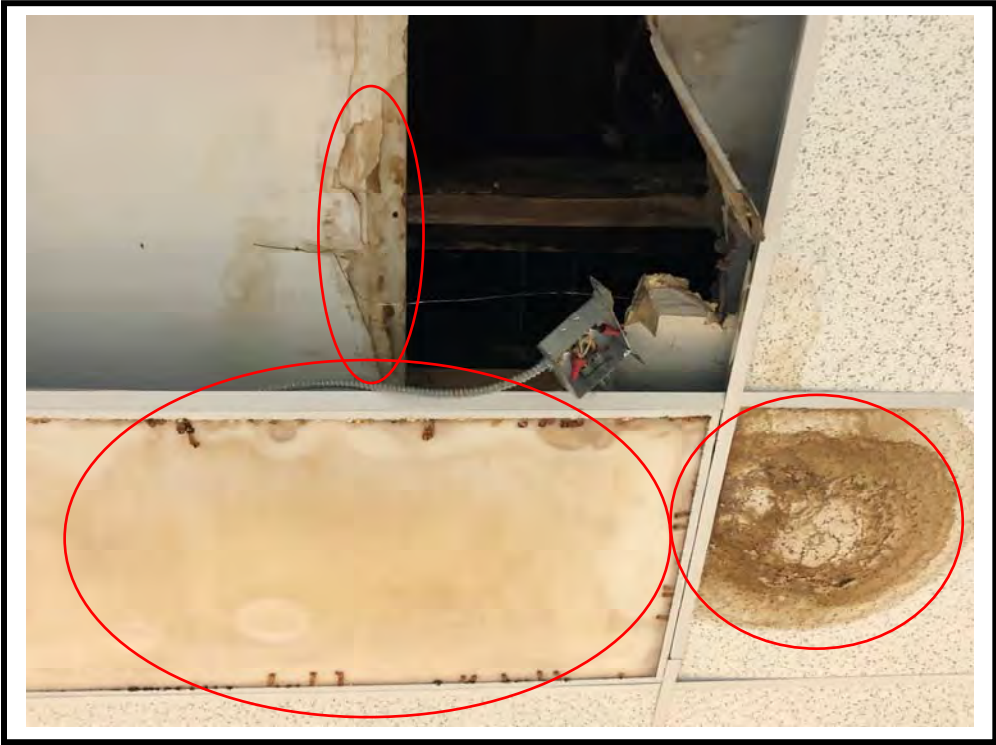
PHOTO LOCATION: Depicts a view of the open area within the buidling.
